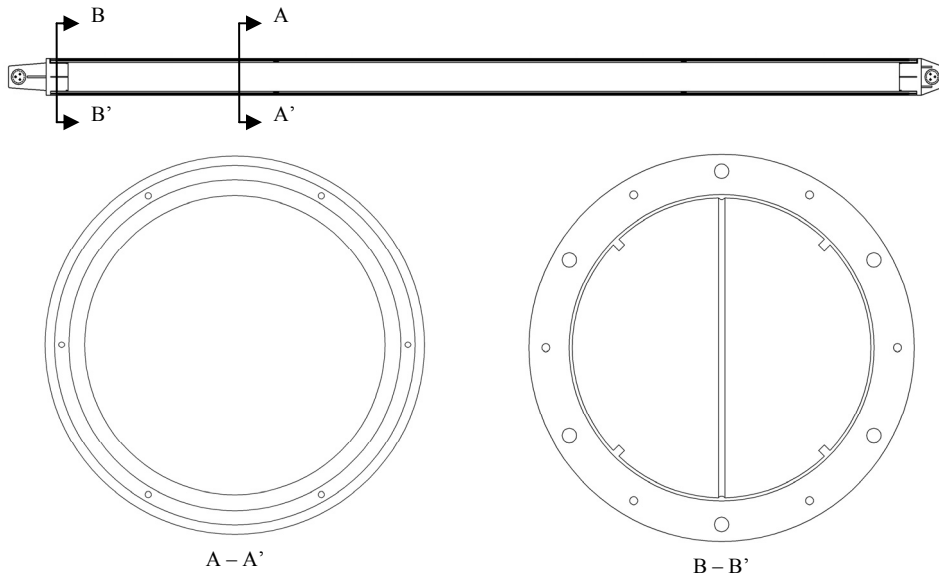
c ATP glass column: longitudinal section and two transverse sections.
